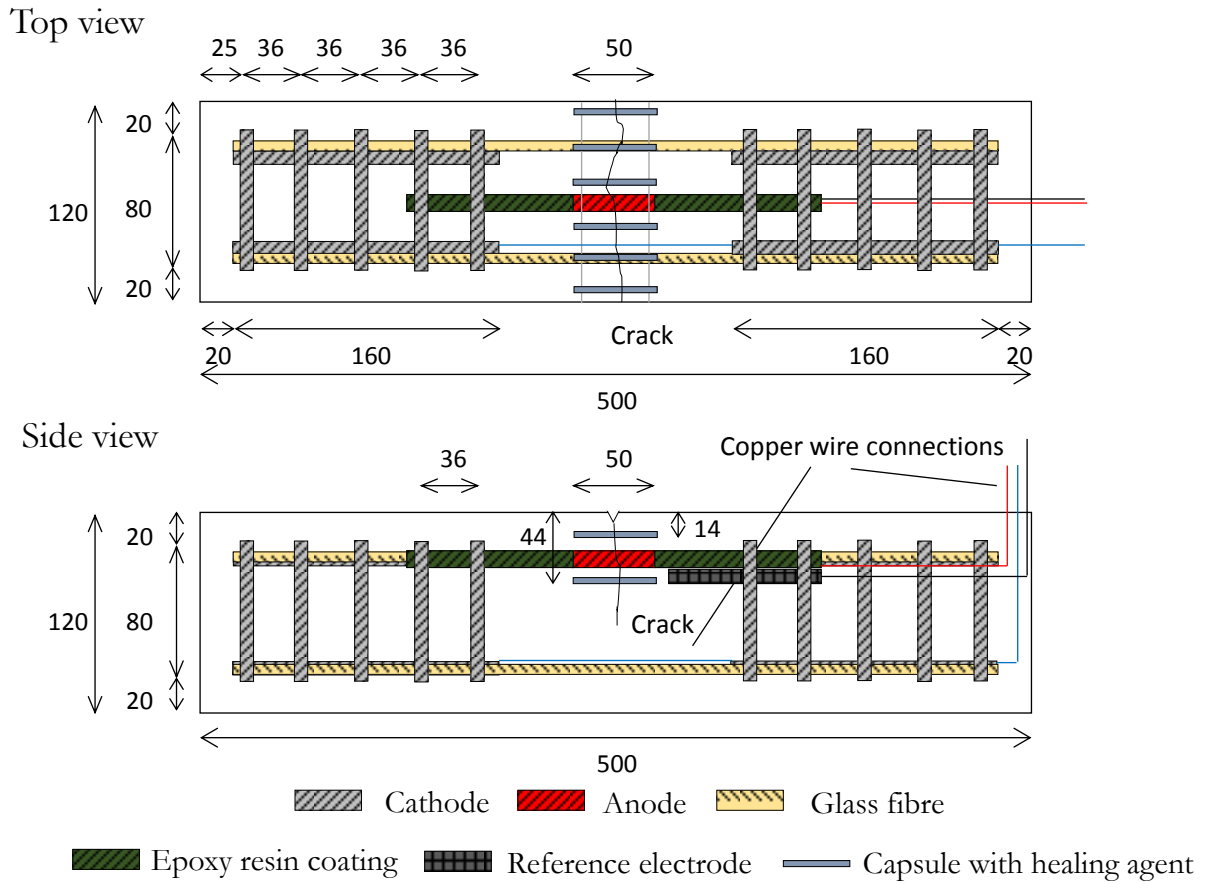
EXPERIMENTAL SETUP FOR AN AUTONOMOUSLY HEALED CONCRETE BEAM (DIMENSIONS IN MM)
